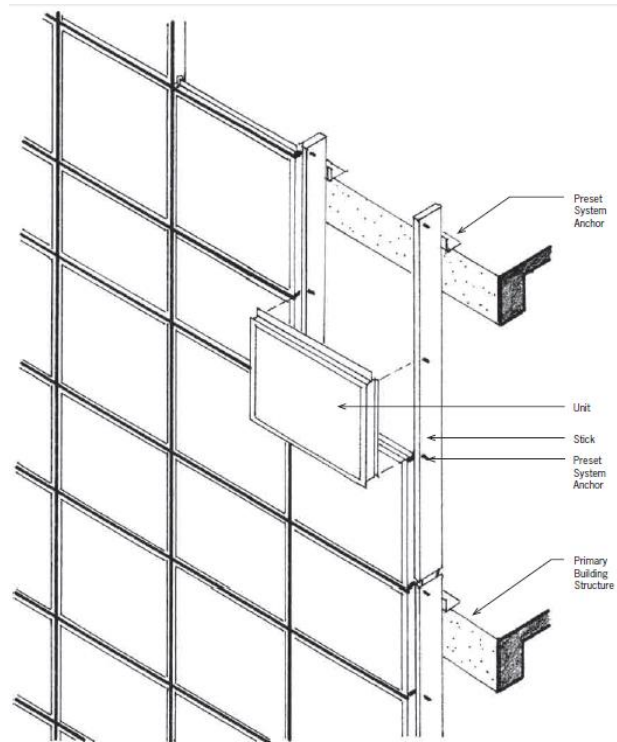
in a unit on a stick system, stick framing is shop-fabricated and anchored to preset system anchors. Shop fabricated and shop-assembled “units” are installed on the sticks at the project site. Source: (Boswell, 2013).
